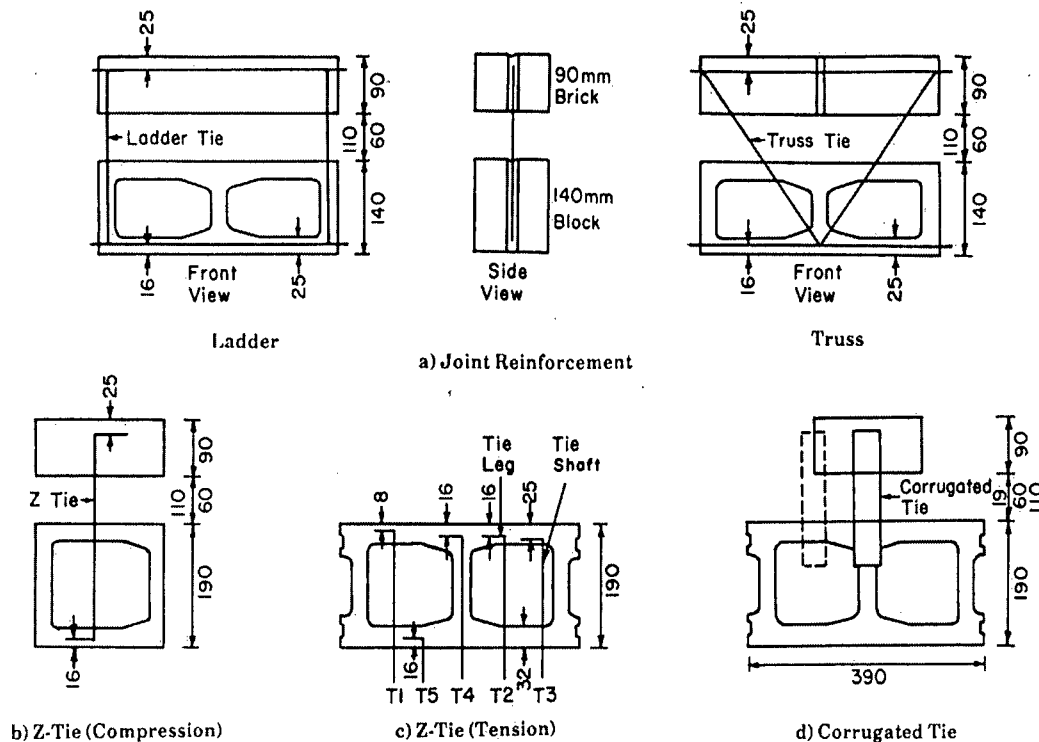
Varied positions of ties in the test specimens to account for the anchorage condition. (From Ref. 28)
